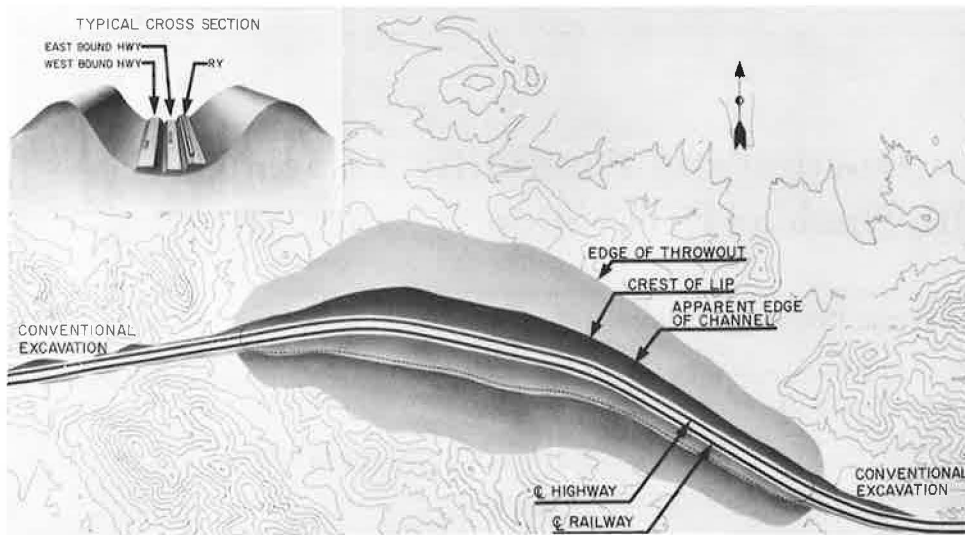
Plan view of the proposed Carryall excavation, showing throwout distribution.
